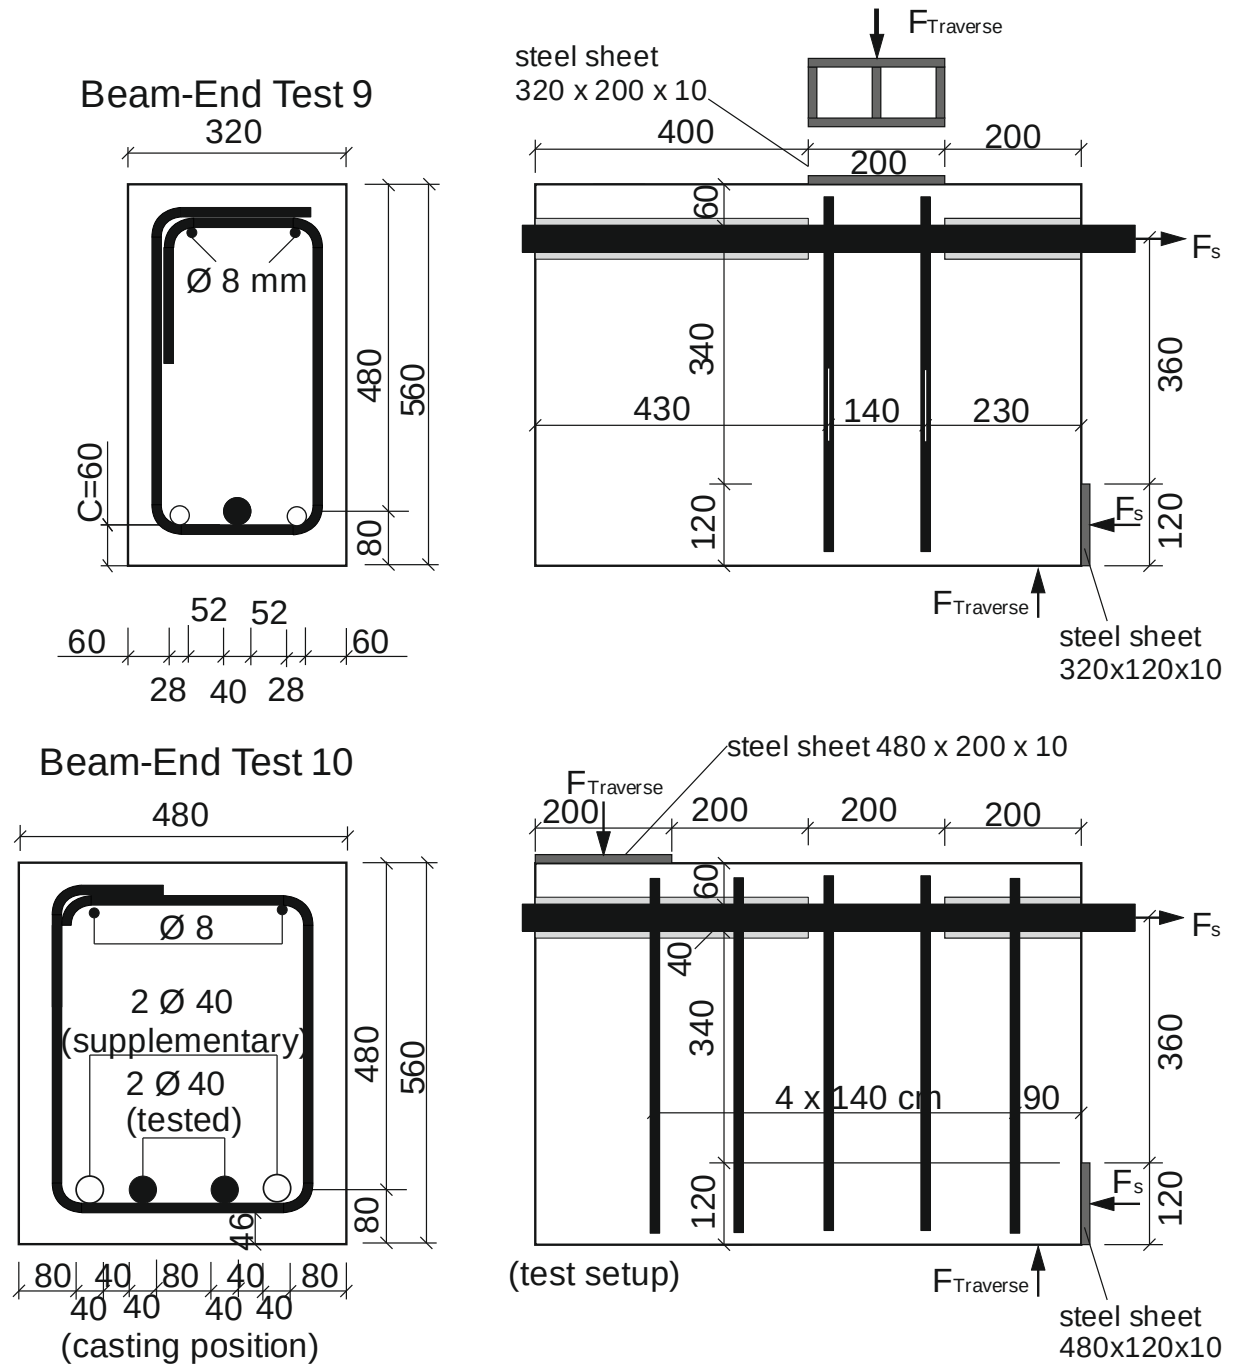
Reinforcement layout of Beam-End Tests 9 and 10
